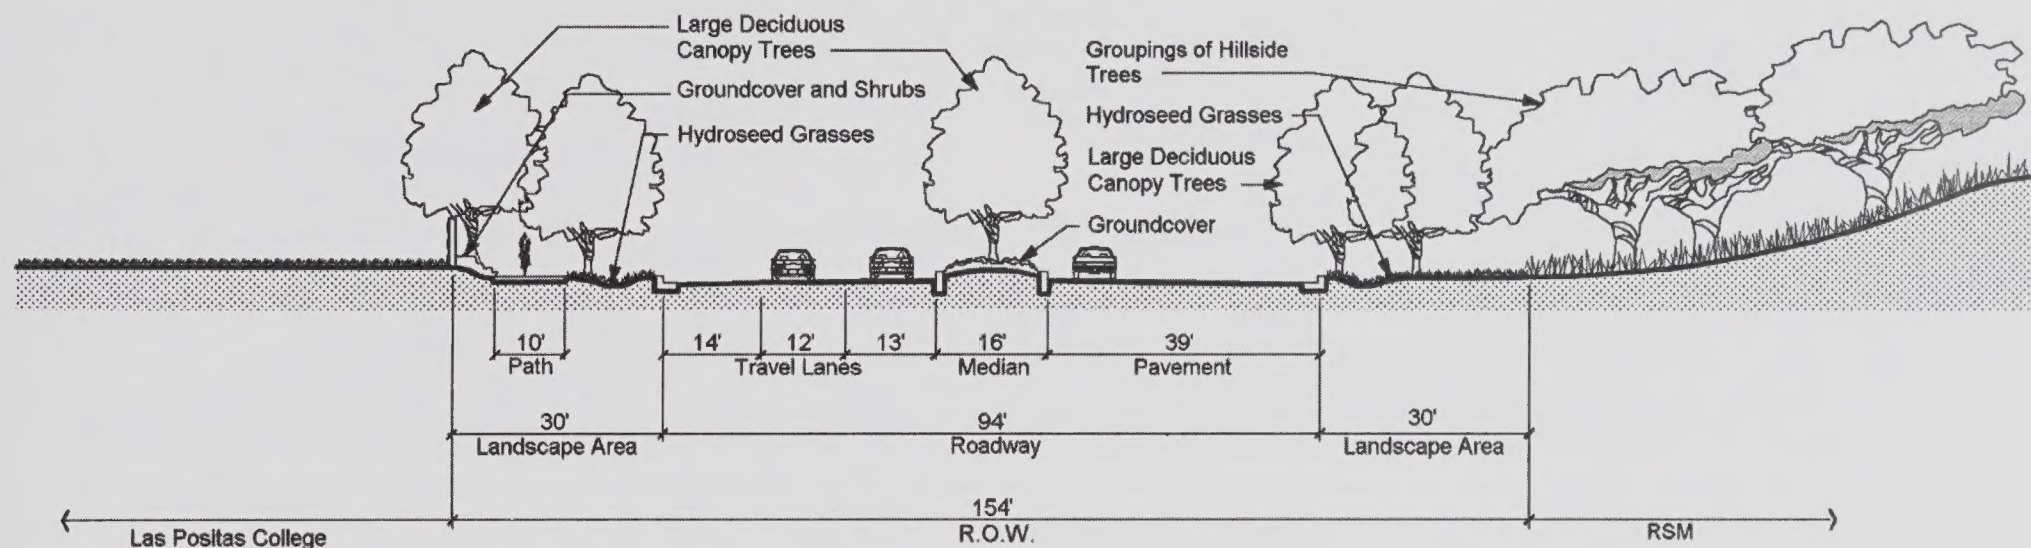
SECTION I – HARTMAN ROAD BETWEEN JENSEN ROAD AND LAS COLINAS AVENUE
